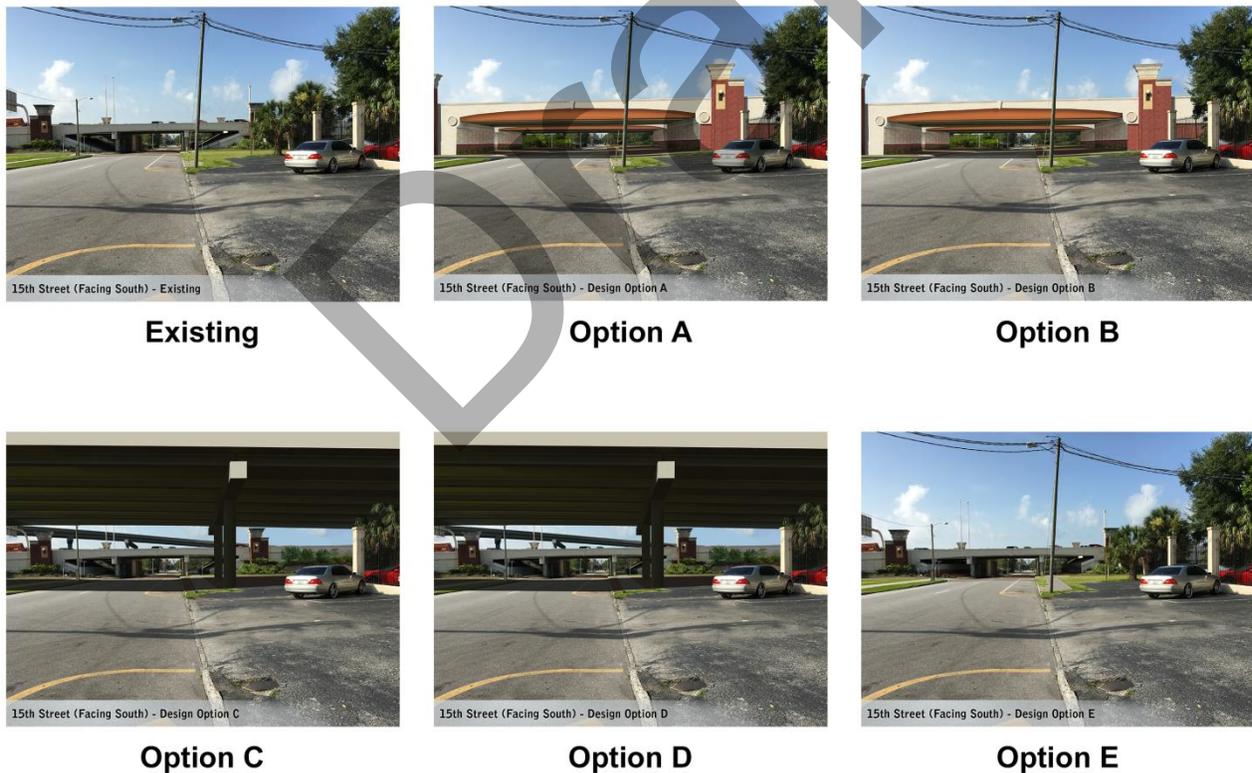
shows an existing photo of 15th Street located on the north side of I-4 facing south along with same view if Design Options A, B, C, D or E are built. Design Options C and D would place the express lane structure closer to the existing site of the photo, while the structure of Design Options A and B would be slightly closer but the urban design of the bridge face would change. Figure 6-13 shows an existing photo of Columbus Drive located on the west side of I-275 facing east along with same view if Design Options A, B, C, D or E were built. The biggest visual impacts would occur if Design Options A or B were built. There would be very little change if Design Options C, D or E were built. Figure 6-14 shows an existing photo of Forest Avenue located on the east side of I-275 facing west along with same view if Design Options A, B, C, D and E were built. With Design Options A and B, the new retaining wall would move closer to the existing photo site, while Design Options C, D and E would be very similar to the existing conditions. Table 6-16 shows the potential for visual adverse effects for a number of contributing factors pertaining to each of the TIS SEIS Segments and design options. Refer to the Section 4(f) chapter of the *SEIS* for more information on visual effects related to parks and to the *CRAS* and *Section 106 Case Study Report* for visual effects related to historic resources.
